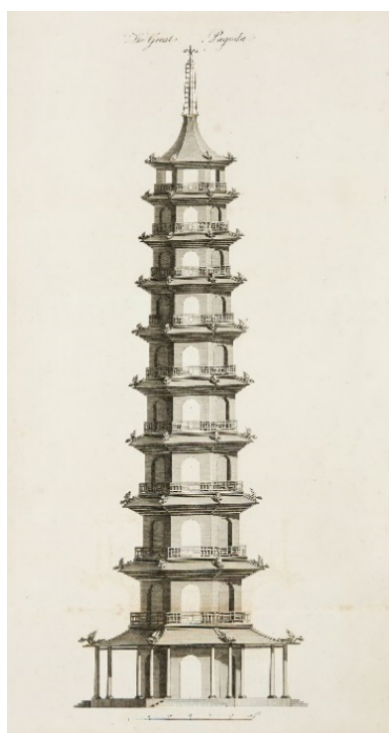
The Great Pagoda, from plans, elevations, sections and prospective views of the Garden Buildings at Kew, William Chambers (1763)
